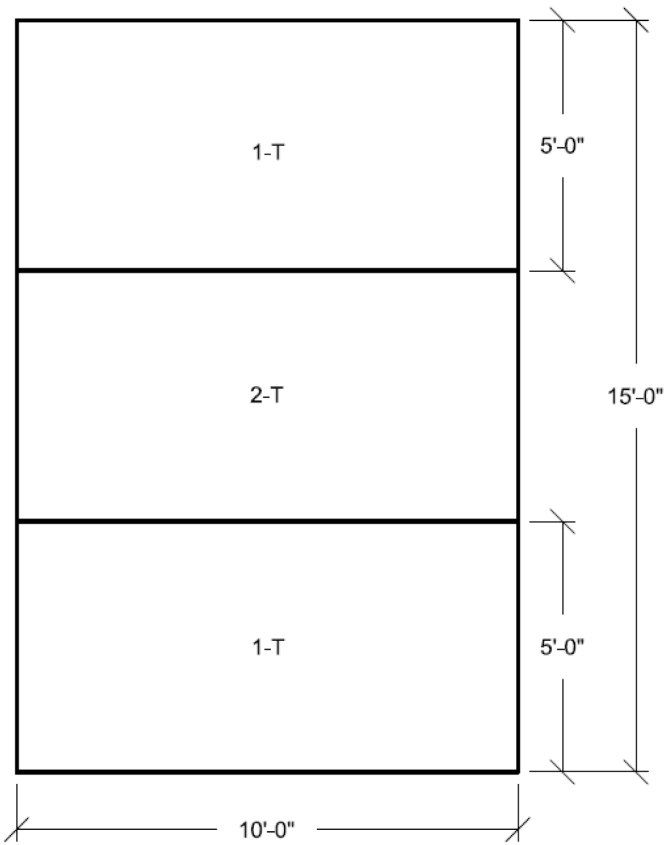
H.6-208 DGFOSV Wall 16 Looking From Outside Transverse Reinforcement Zones
